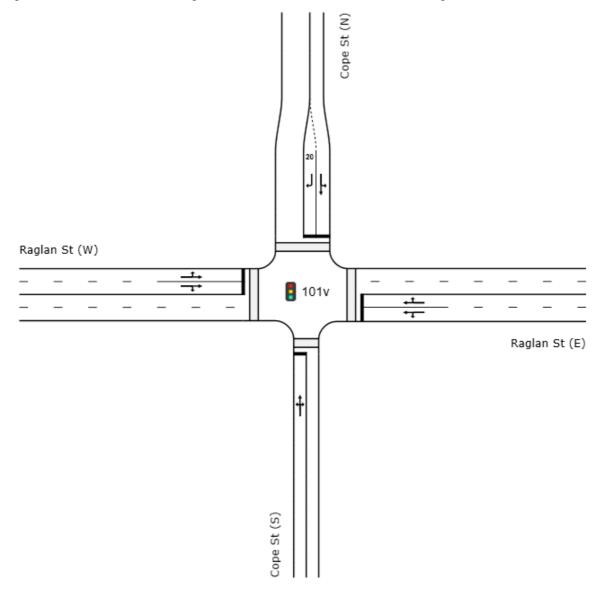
Cope Street and Raglan Street Intersection Upgrade
